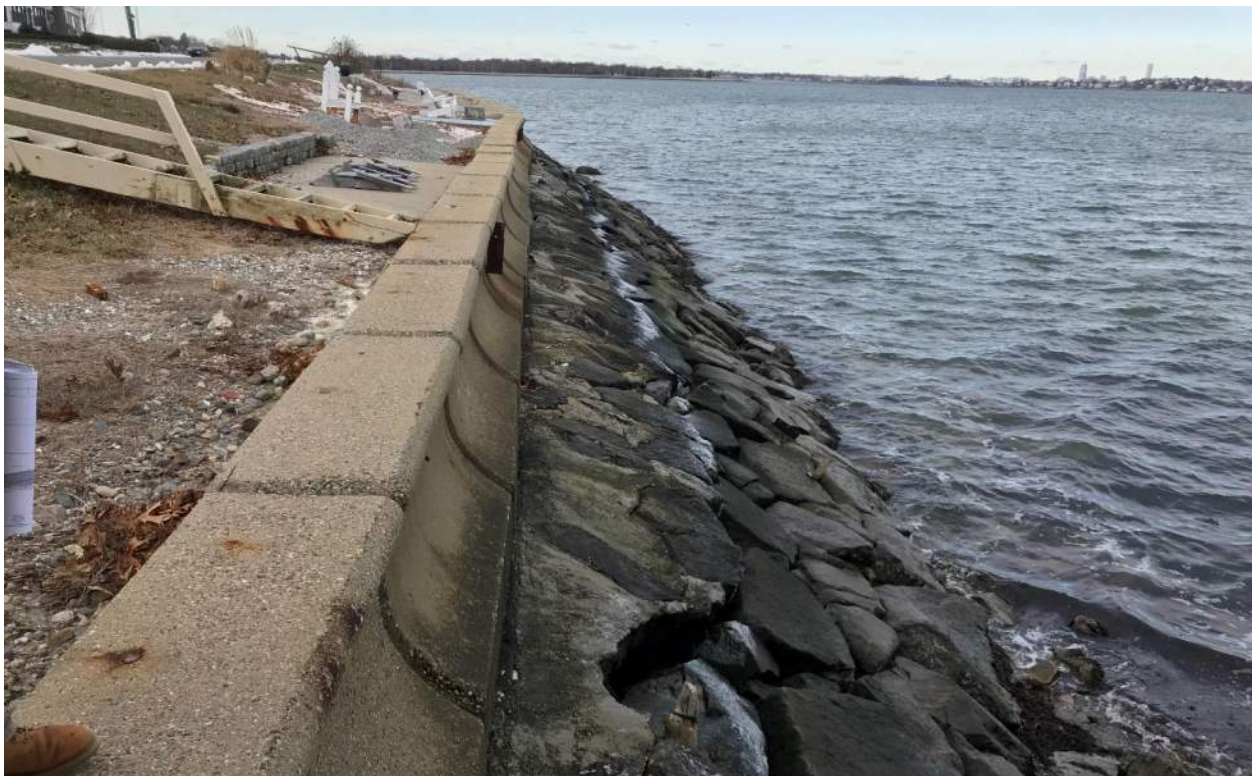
View looking north-northwest from near 72 Shelton Road toward the precast concrete seawall and revetment; revetment voids are filled with concrete (12/14/17).
